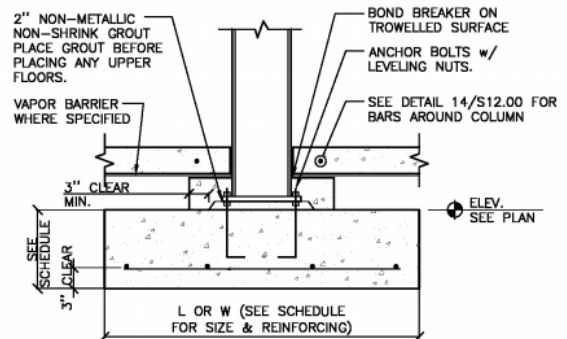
Typical Concrete Column Footing (S12.00 Drawing 10)
